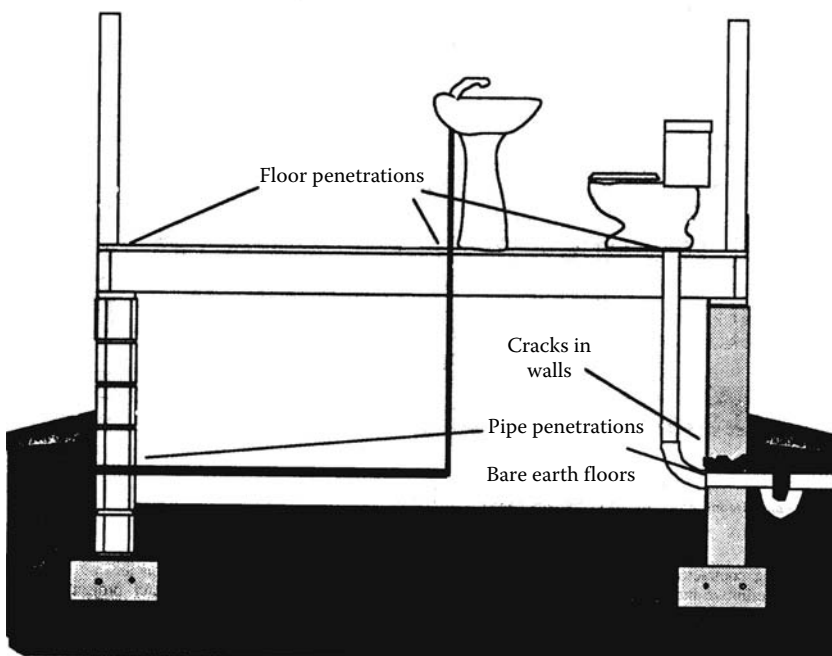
Typical crawlspace foundation entry route. (Adapted from U.S. EPA, *Radon-Resistant Construction Techniques for New Residential Construction—Technical Guidance*, EPA/625/2-91/032, U.S. Environmental Protection Agency, Washington, DC, February 1991.)
